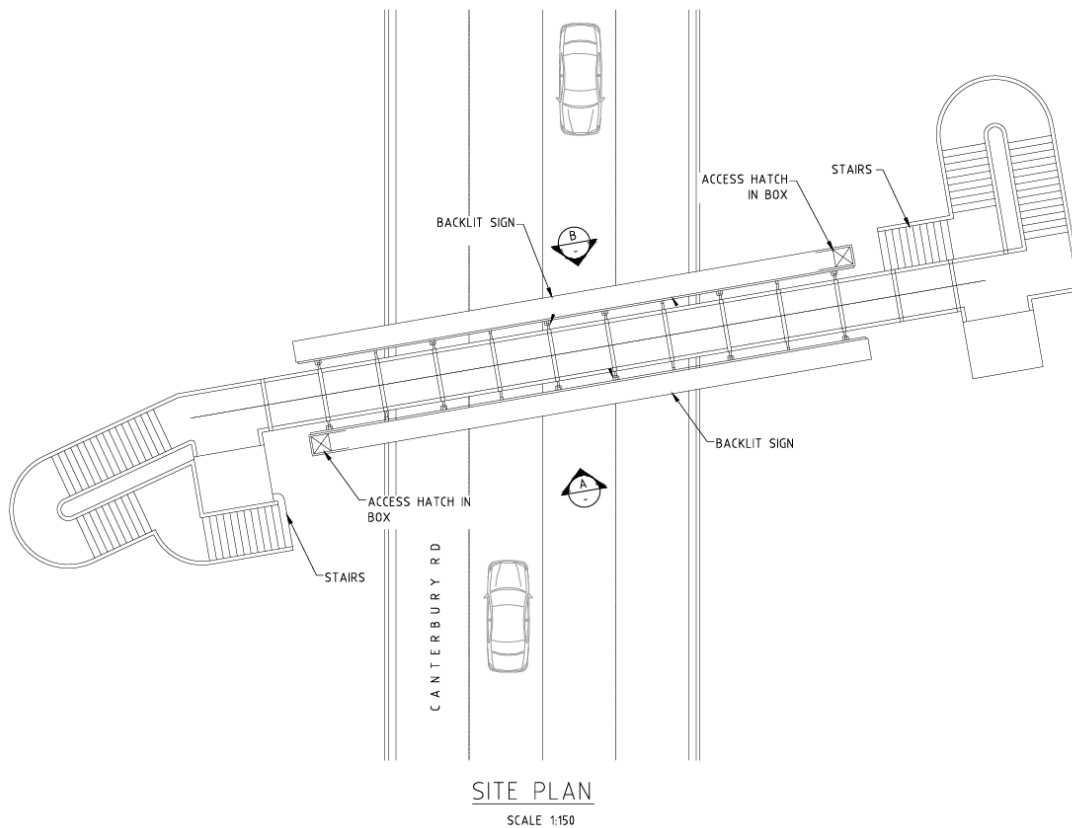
Site plan (Source: Dennis Bunt Consulting Engineers)
